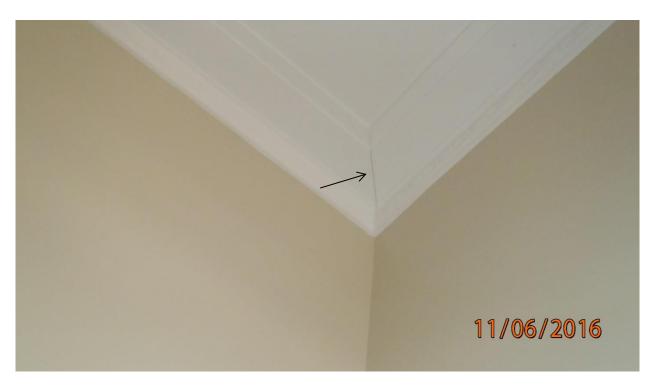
shows a crack to the mitre joint of the cornice in the south western corner of Bedroom 1
